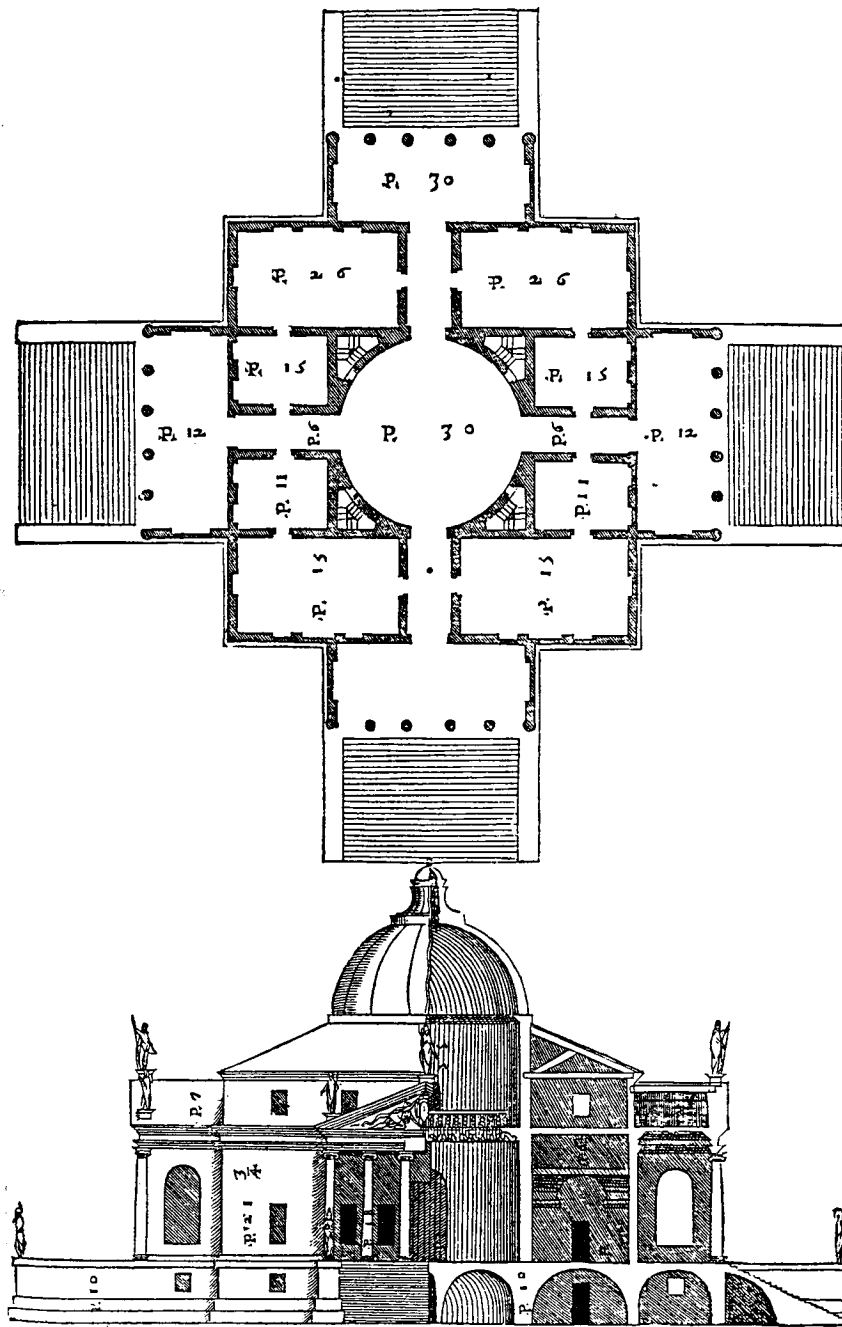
Andrea Palladio: plan and section of Villa Capra (from "Quattro Libri")
